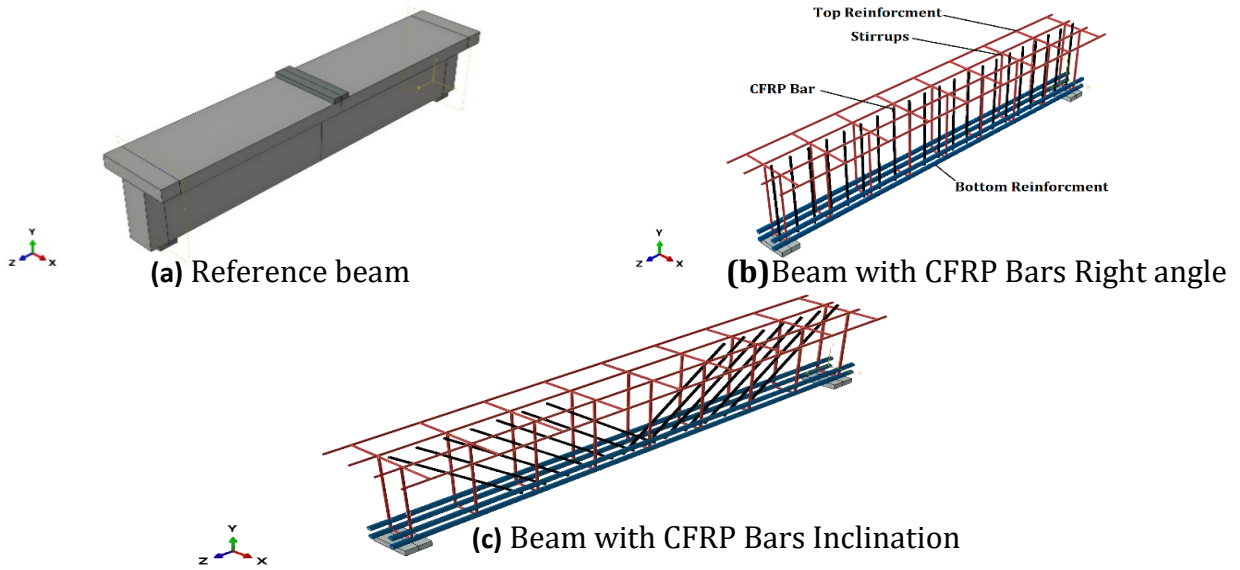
Creating parts and assembly in ABAQUS, a) Reference beam., b) Beam with CFRP Right angle, c) Beam with CFRP Inclination
